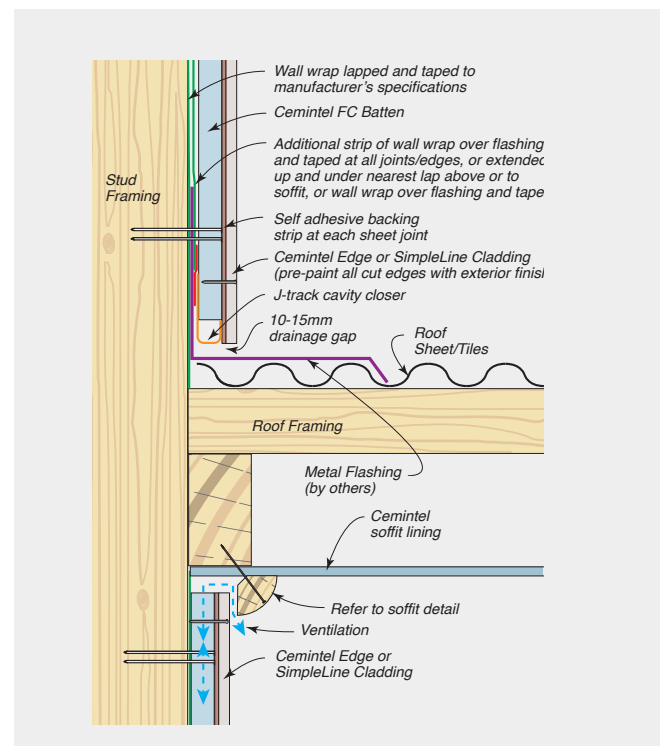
Junction of Edge Cladding with External Parallel Roofing
